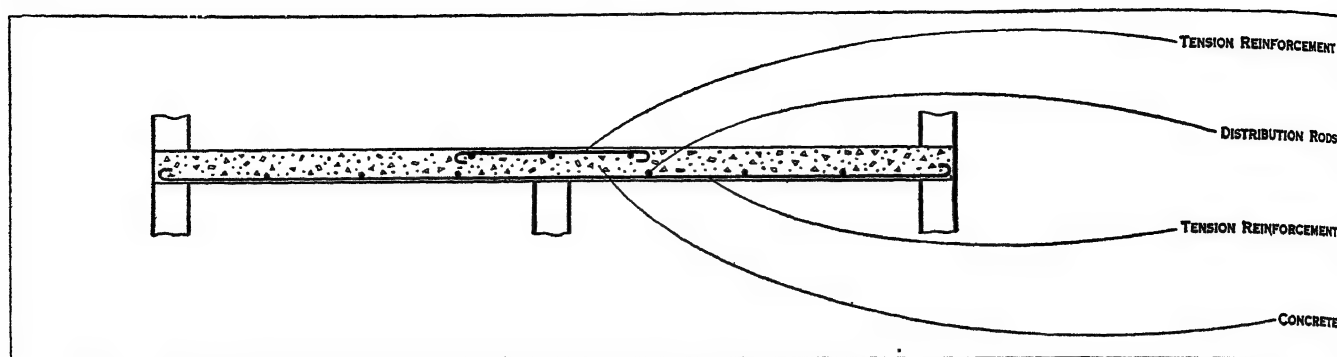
CROSS-SECTION OF FLOOR SLAB, SHOWING THE ARRANGEMENT OF REINFORCEMENT RODS IN THE CENTRE, WHERE TENSION OCCURS
